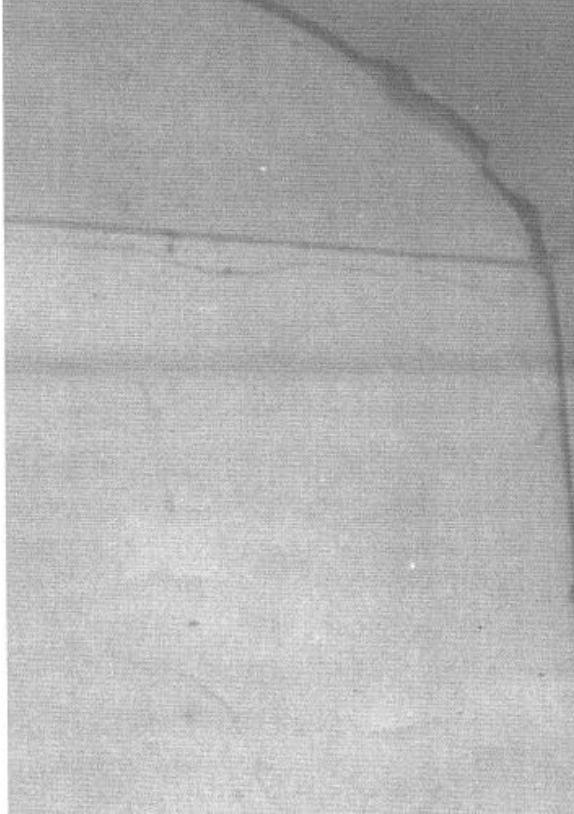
Intersection of wall and vault roof cracked resulting from seismic loading.
